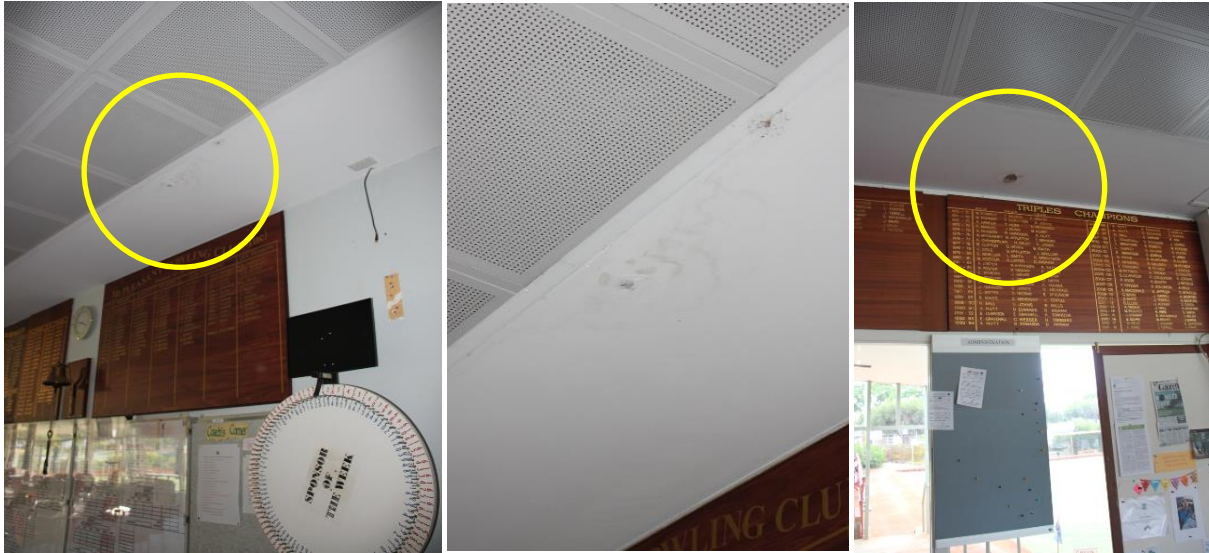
Photo 56, 57 & 58 – Bar area ceiling
